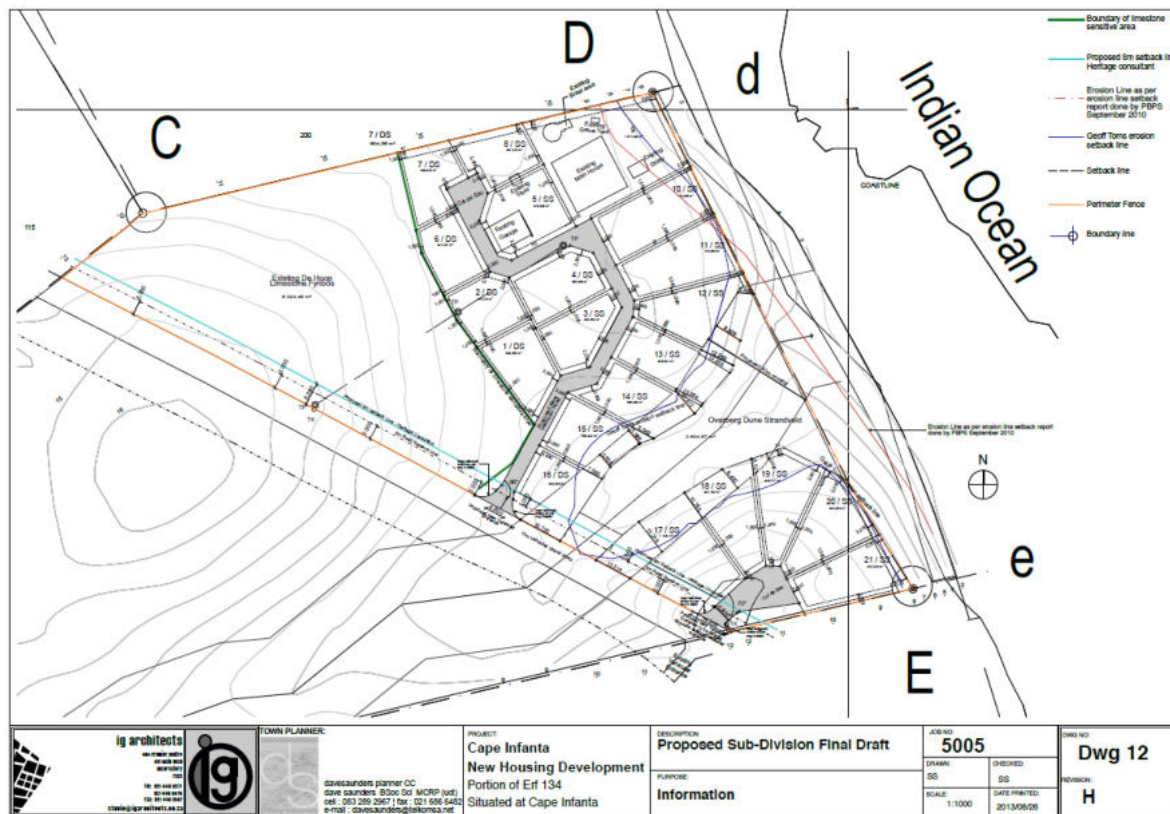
Alternative 2 layout for erf 134 Cape Infanta, comprising 21 erven and a conservation area in the north-western corner.
